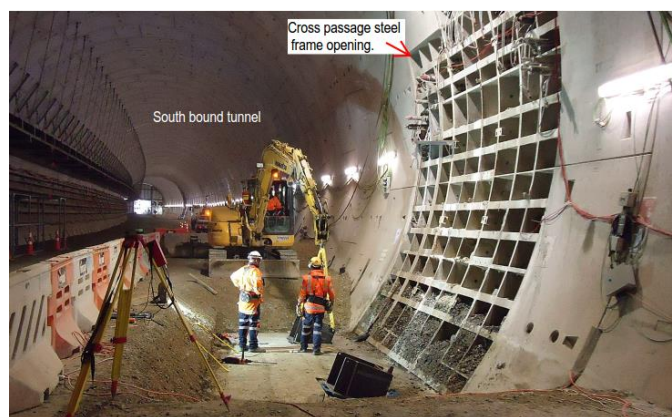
Cross Passage steel segment entrance along the south bound tunnel.
